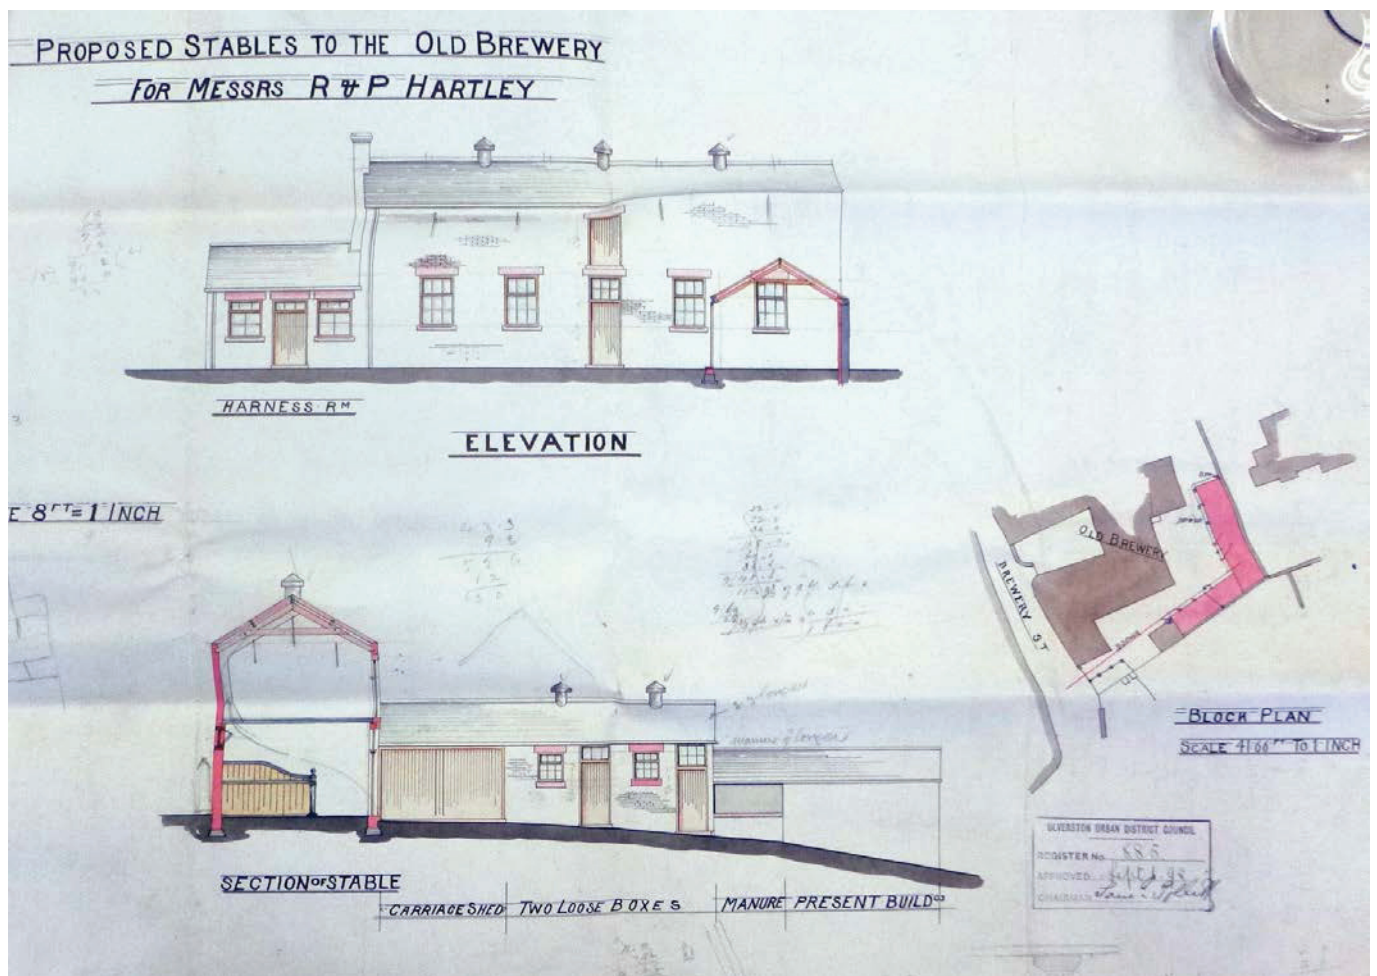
Block plan, elevation and section drawing for proposed stables to the Old Brewery, 1898
